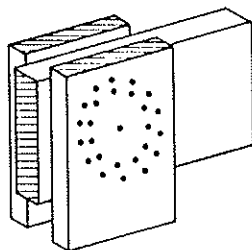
Types of Joint with Dowels Used for The Beam Column Connections
